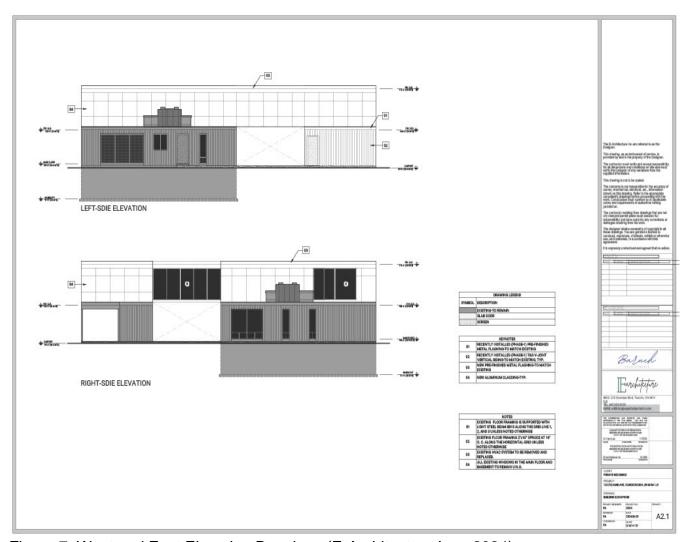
West and East Elevation Drawings (E-Architecture Inc., 2024)
